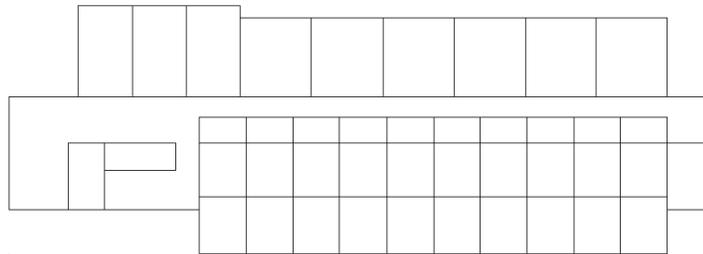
Overlapping wall partitions on the 8 storeys of the original concrete plan
